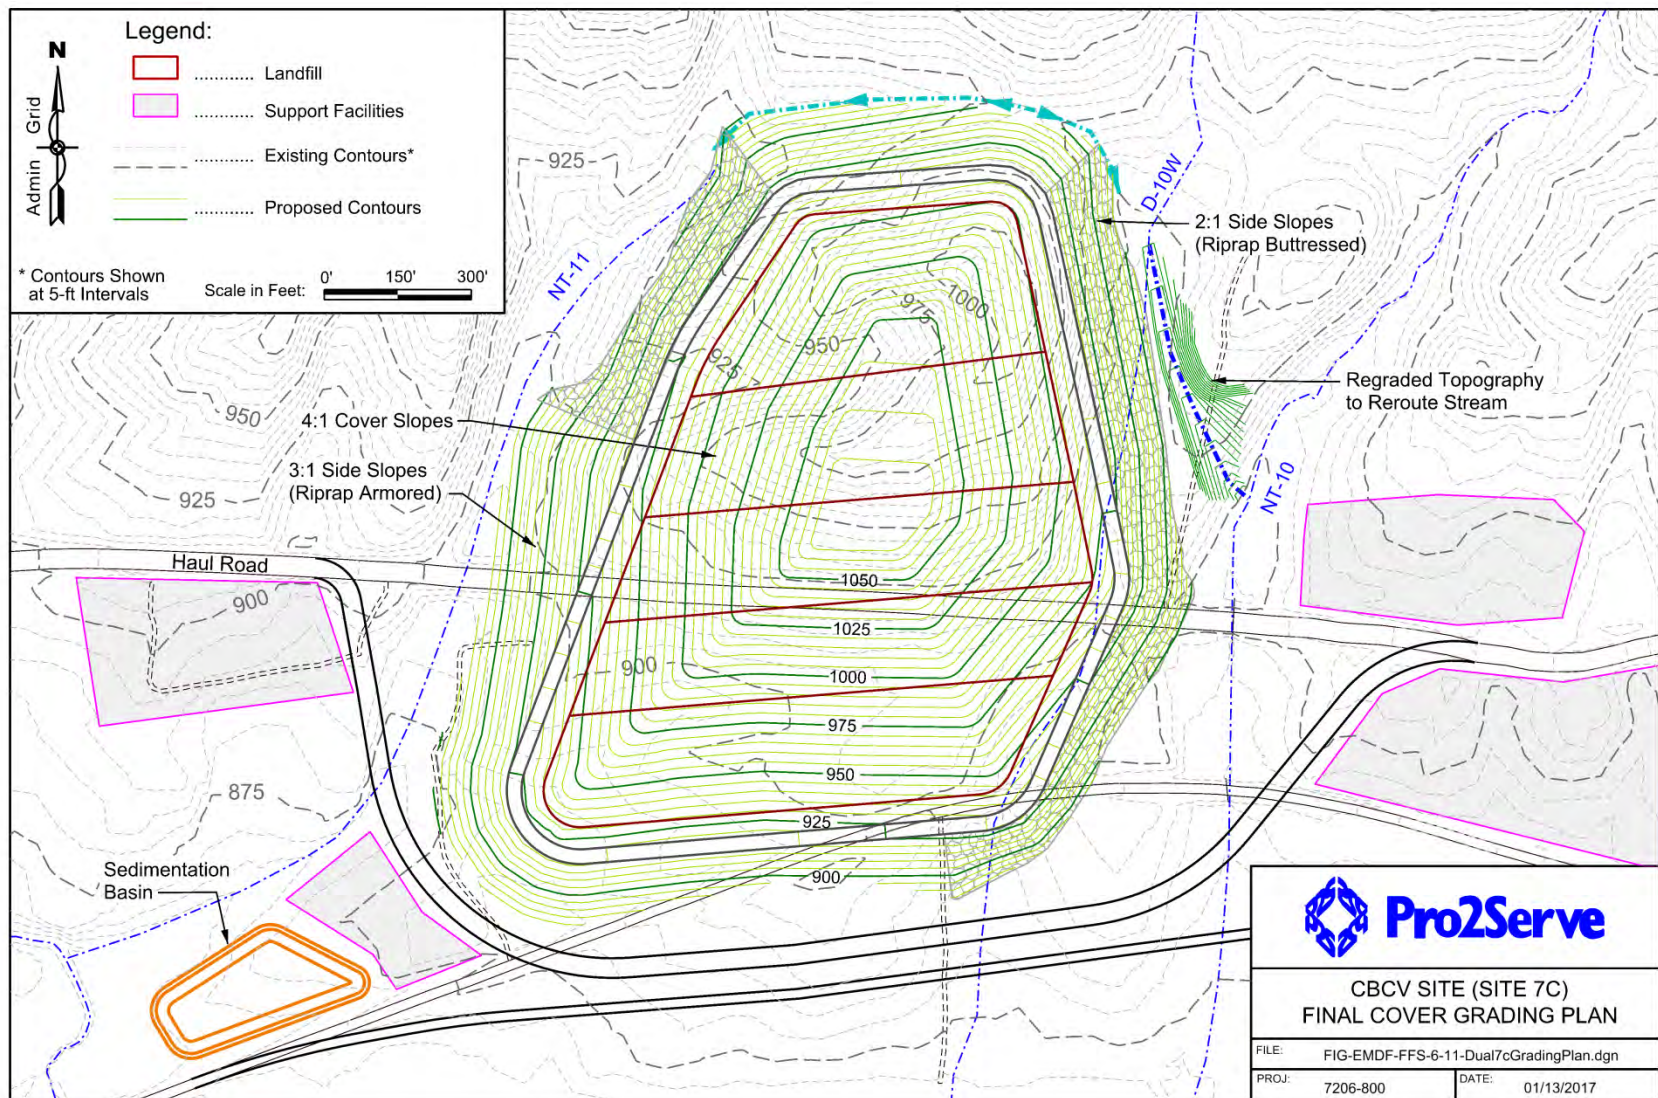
EMDF Final Cover Grading Plan for CBCV Site
